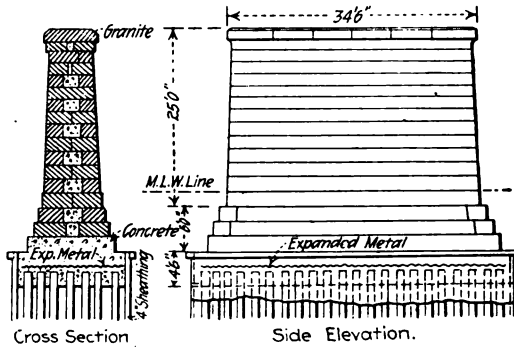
Capped Pile Foundation, Penrose Ferry Bridge, Philadelphia, Pa.
